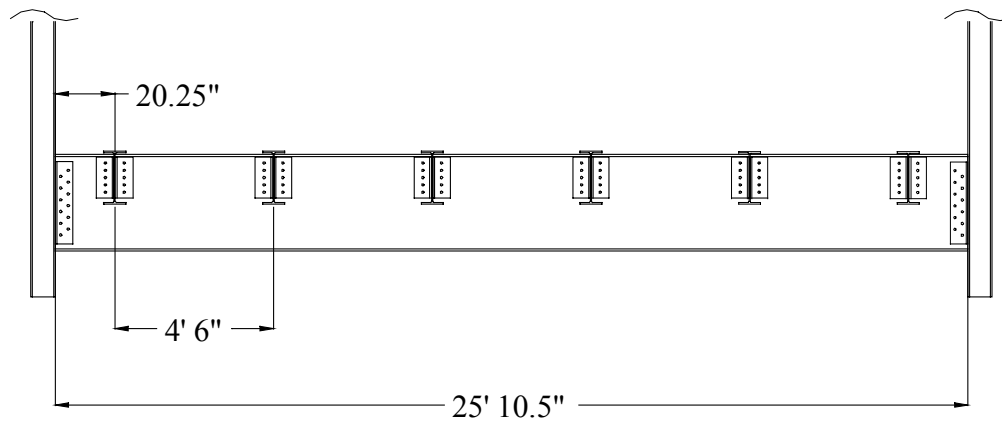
Transverse beam attached to the truss verticals, with connecting longitudinal stringers
